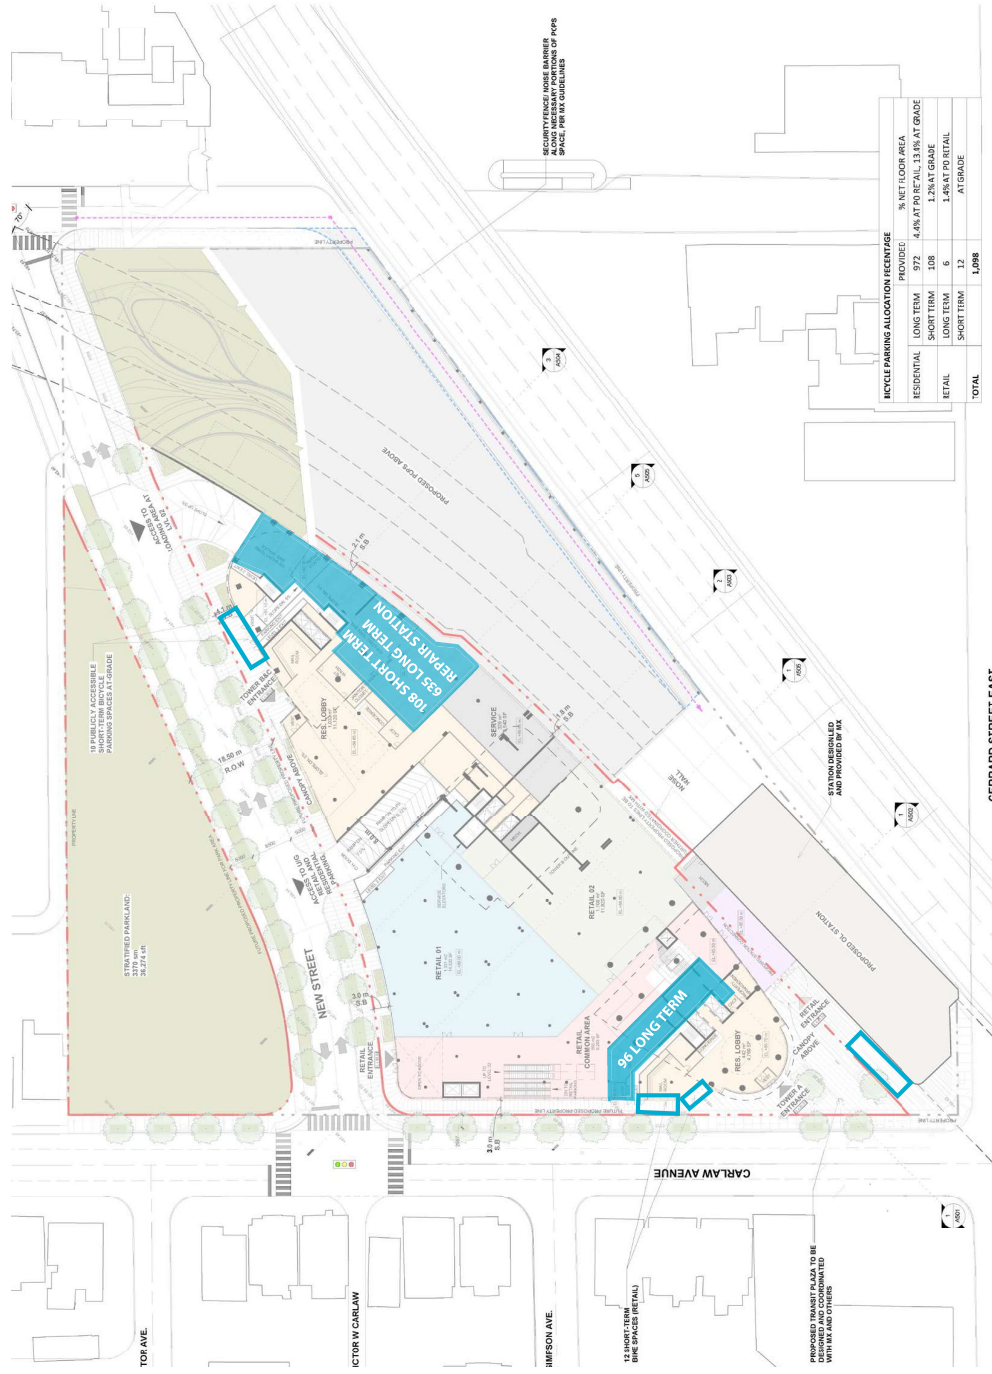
Floor plan highlights long-term and short-term bicycle parking
